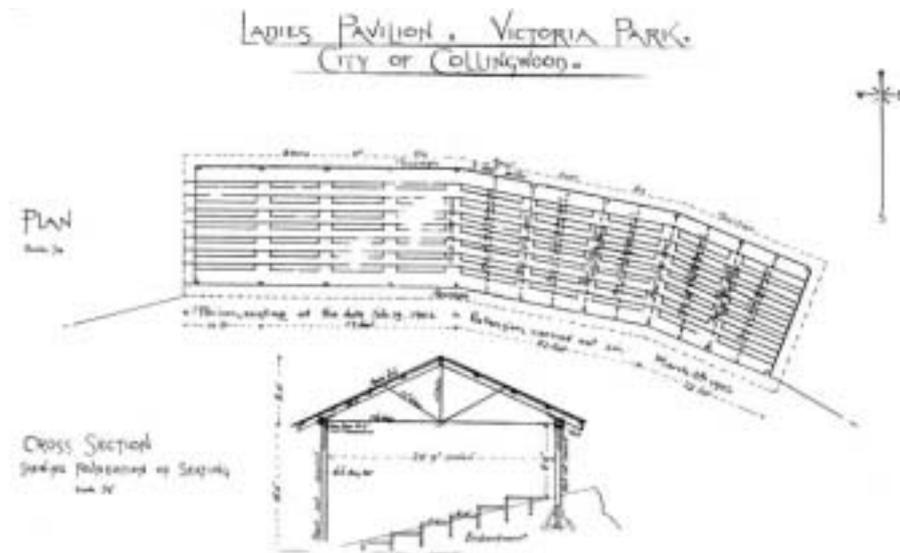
Plan and cross-section of the Women's Pavilion, indicating that the structure (in curved plan form) was built in two stages, with the original portion extended to the east in 1902.
